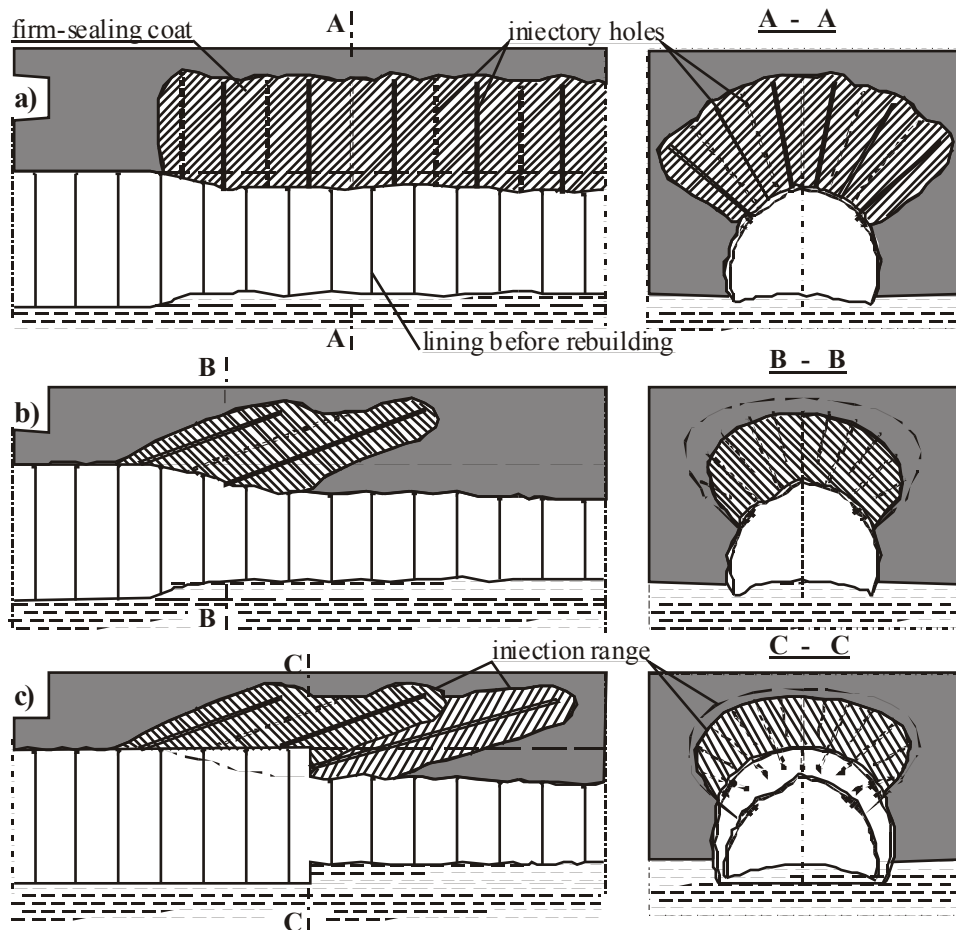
Diagram of placement iniection holes for sealing and firming rock mass, preceding dog heading rebuilding
